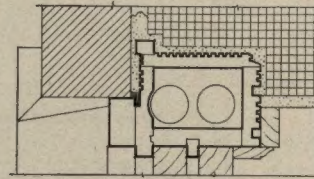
13-inch brick and tile wall with inside plaster reveal and narrow wood trim. Note position of anchor strip to give regular 5 1/4-inch jamb width.
